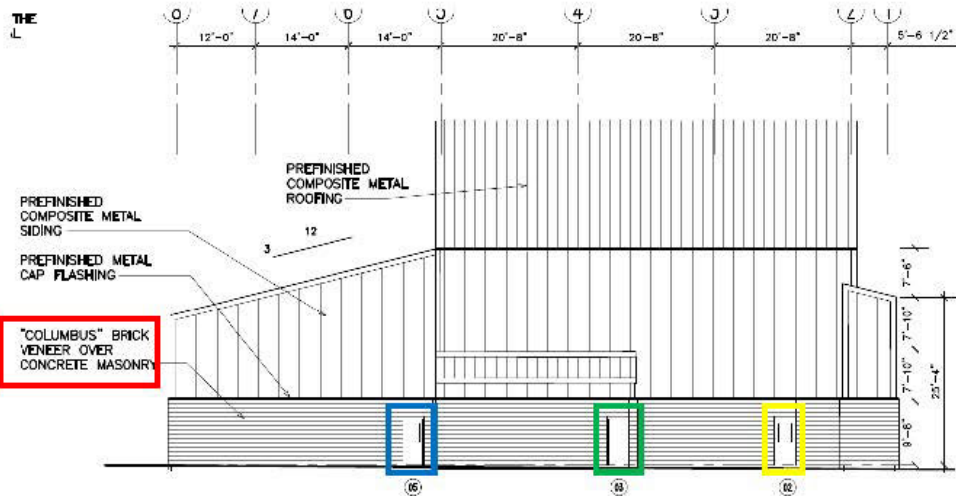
Image showing the proposed configuration of the northeast elevation. The note indicated in red, which is shown on the 35 percent design plans, indicated that brick veneer would be installed; however, that design element has been removed to avoid impacts to the historic property. One door would be replaced in-kind within the nose dock area (indicated in
